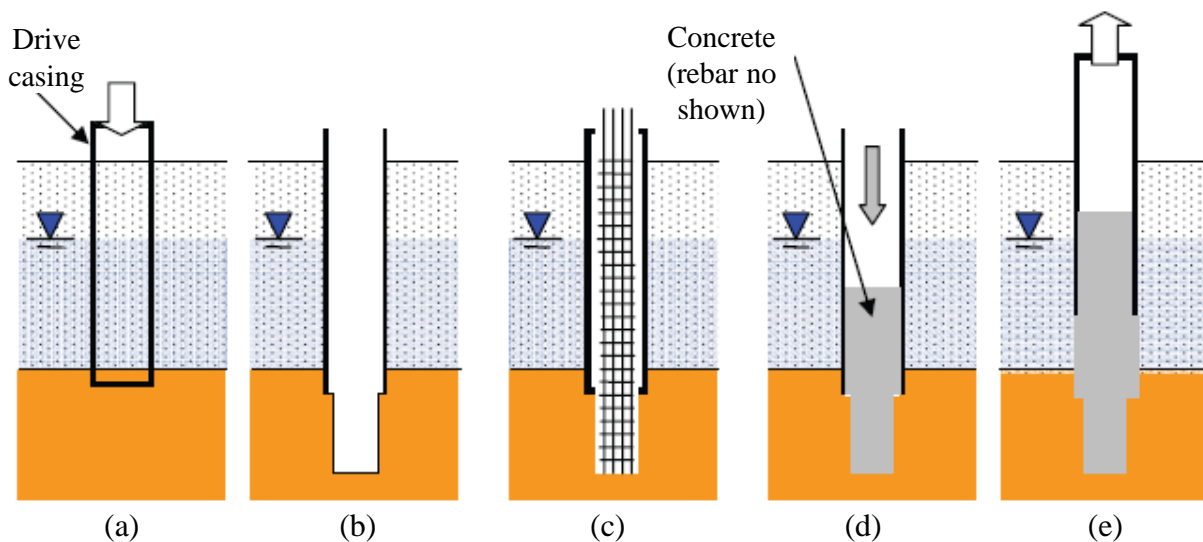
Construction using casing advanced ahead of excavation: (a) drive casing into bearing stratum; (b) drill through casing; (c) complete and clean hole, set reinforcing; (d) place concrete to head greater than external water pressure; (e) pull casing while adding concrete (Brown et al. 2010)
